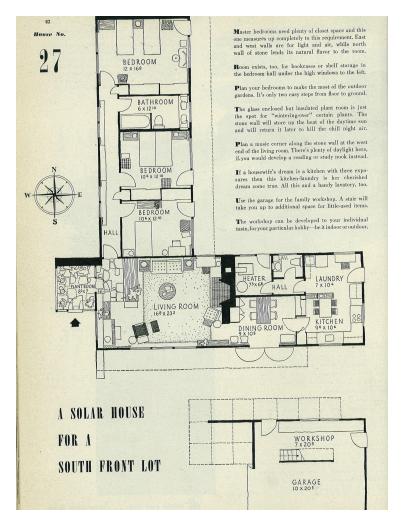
Floor Plan, "A Solar House for a South Front Lot," *House Beautiful*, January 1948: 82.
